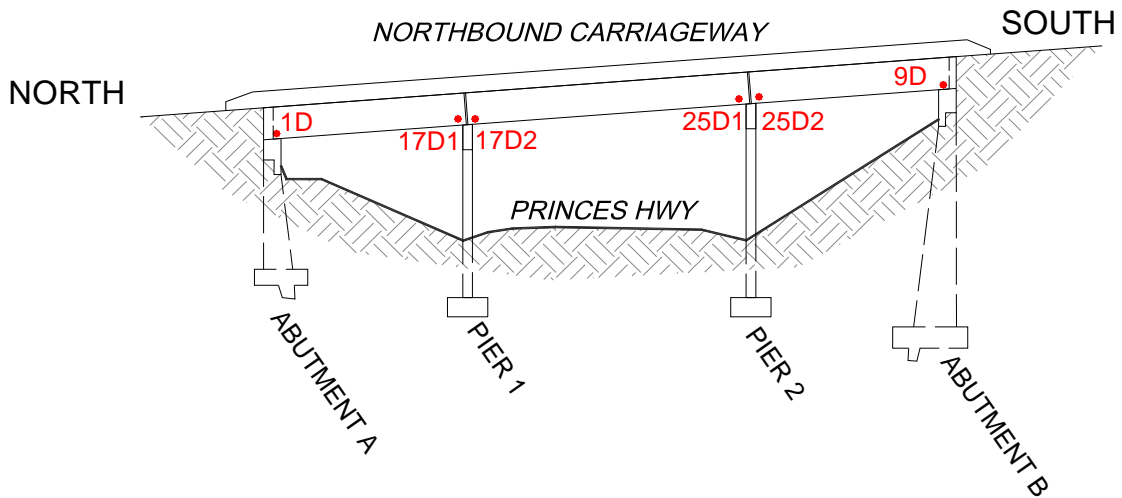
Bridge 2 - Deck Girders – Elevation 1 – Relative 3D Monitoring Locations
